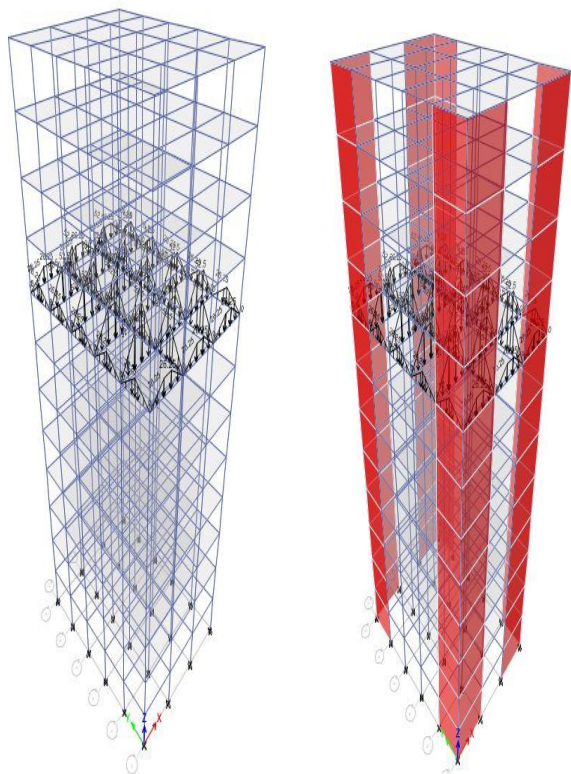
3d View Of Building With Heavy mass at 8th floor With And Without Shear Wall
